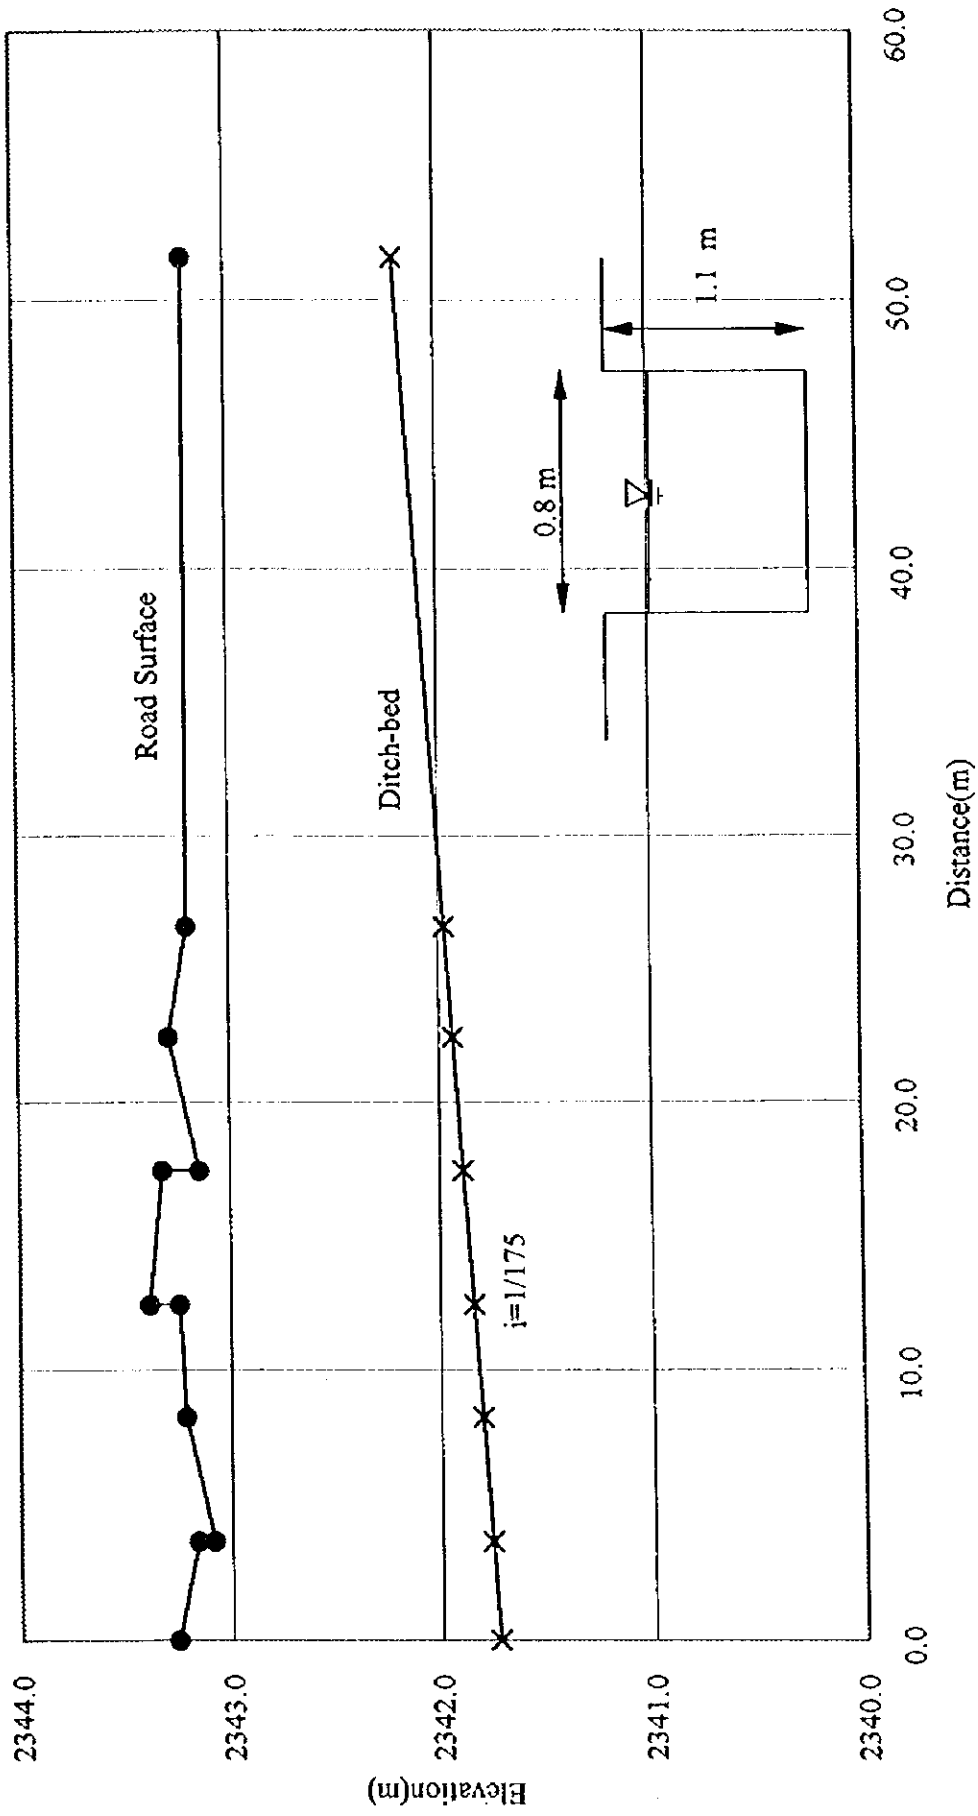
Longitudinal and Cross-sectional Profiles of Drainage Ditch for E2 Basin
